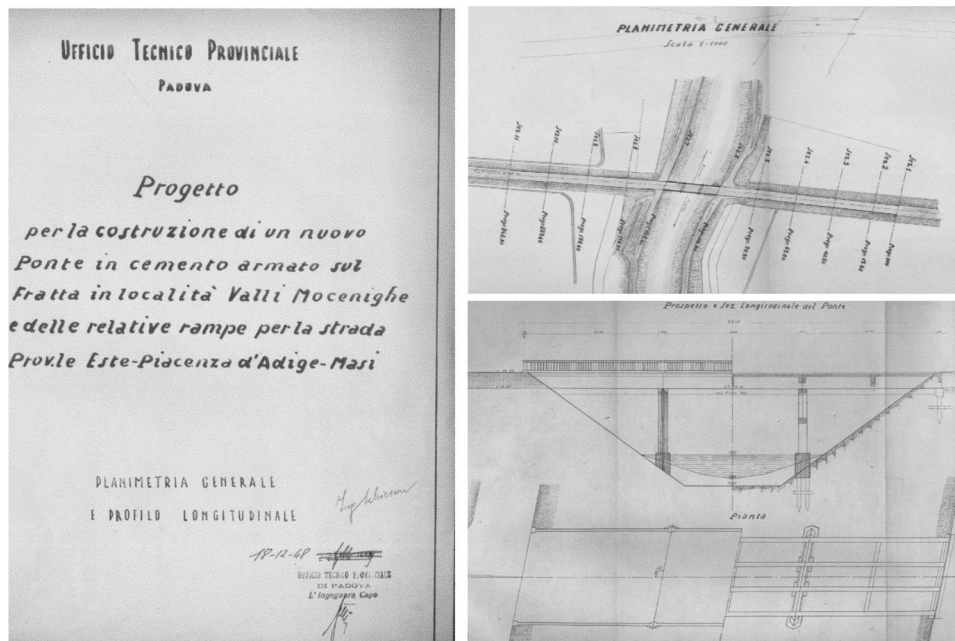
Original drawings of the Fratta bridge project: project cover page; general plan of the site and side and plan view of the bridge.
